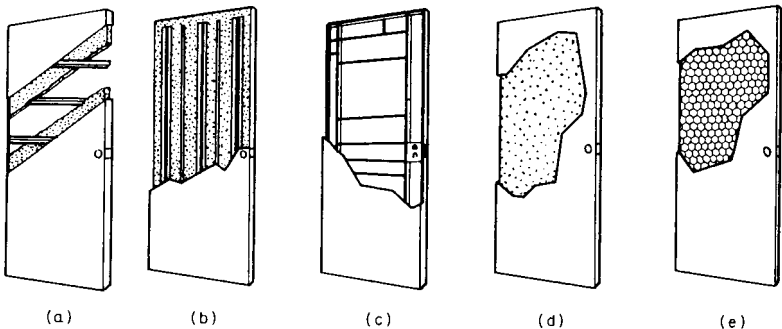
Some types of bracing used for hollow steel doors: (a) horizontal stiffeners; (b) vertical stiffeners; (c) grid of horizontal and vertical stiffeners; (d) rigid insulation core; (e) honeycomb core.
